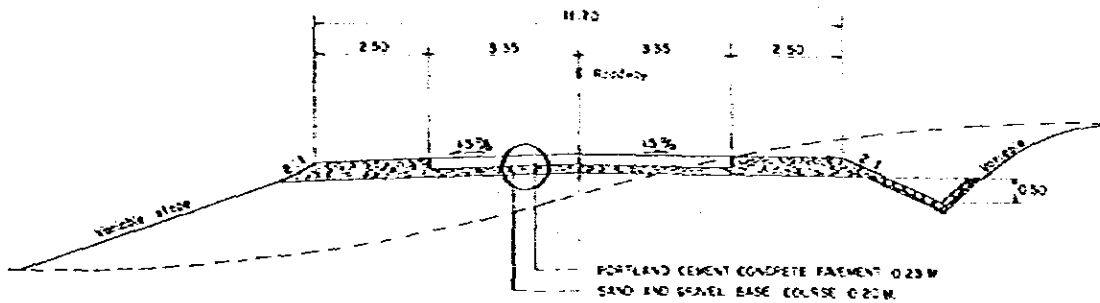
TYPICAL CROSS SECTION FOR FLAT AND ROLLING SECTION
